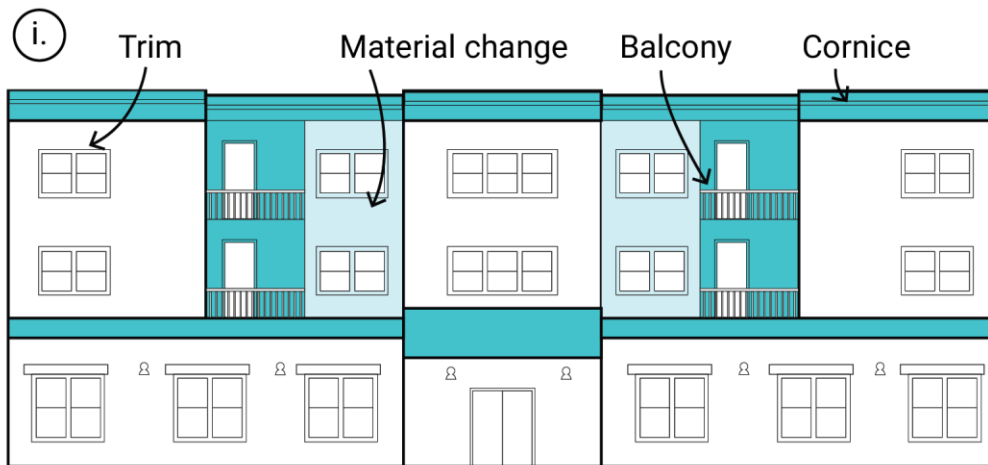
(B)(5)(a)(i): Façade detailing design elements
